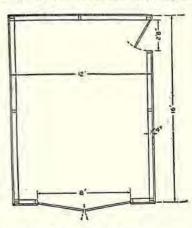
Floor plan, showing the location of the sills, studs, and corner posts on the concrete floor.
